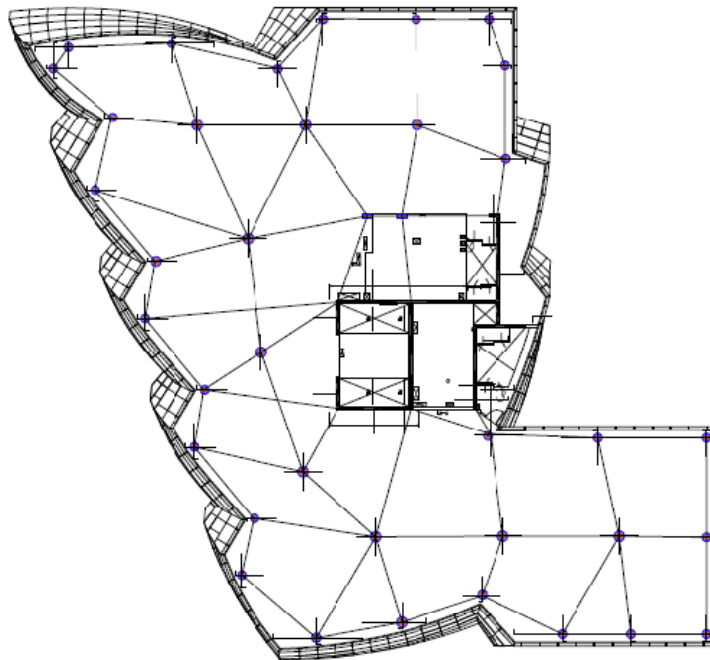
Fifth Floor Plan (note: very similar to first through fourth floor plans)
